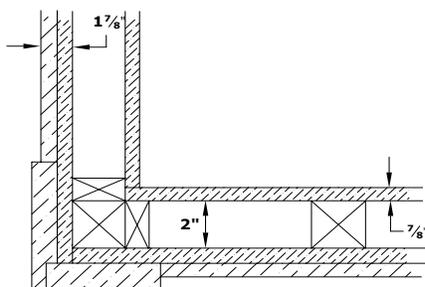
Typical corner section based on original drawings and field observations. (NPS-SERO-CR, 2002)
